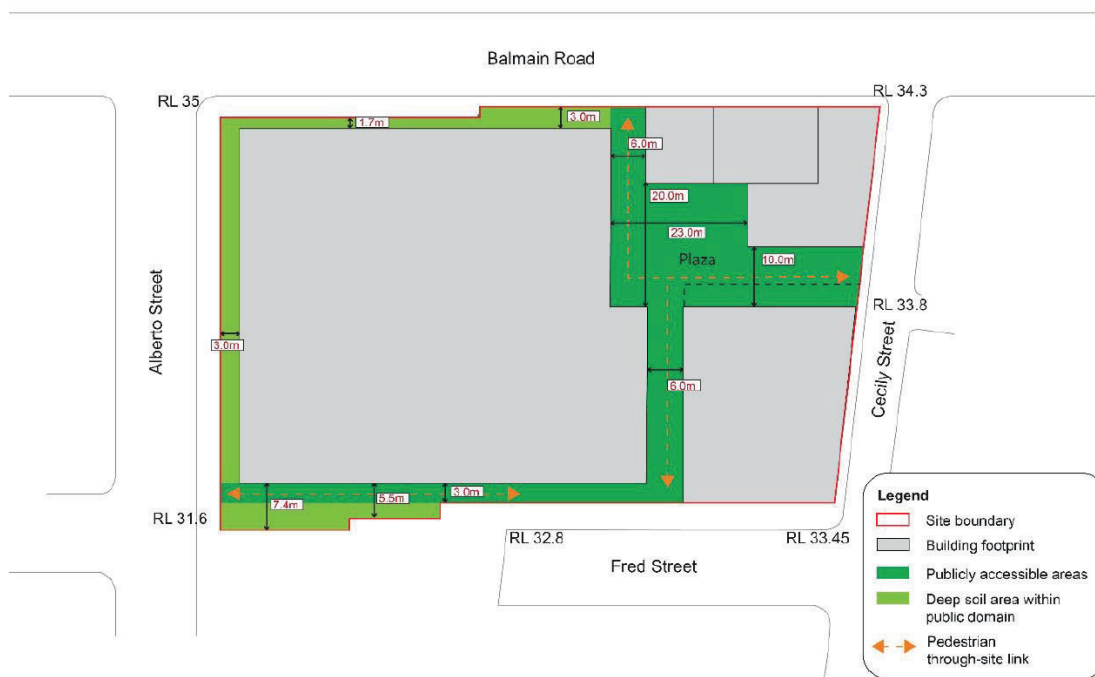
Public domain, deep soil planting and pedestrian through site links (Draft Balmain Rd Site Specific DCP)
